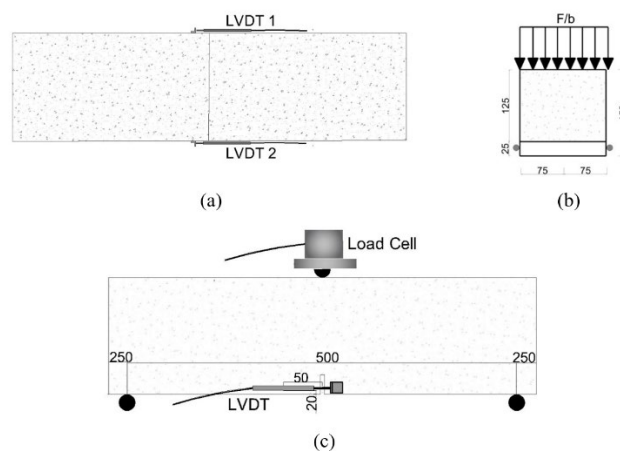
Three point bending test setup in accordance with RILEM TC 162 [19]; a: plan view; b: cross section of specimen; c: side view of specimen. Dimensions in mm.
